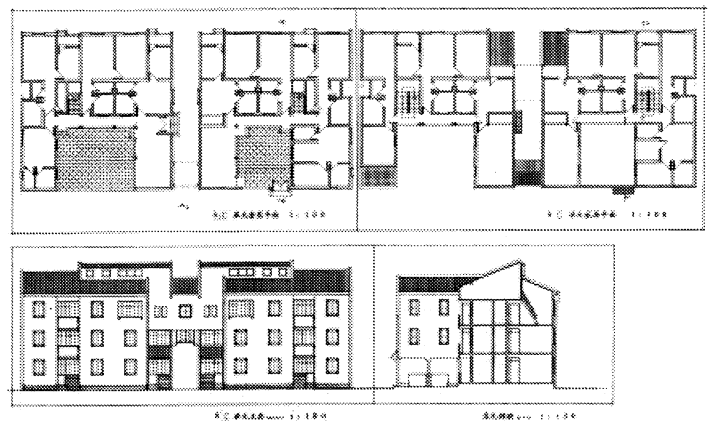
Plans, section and elevation of type one new houses. (Clockwise from top left: first floor plan, second floor plan, section and elevation.)
